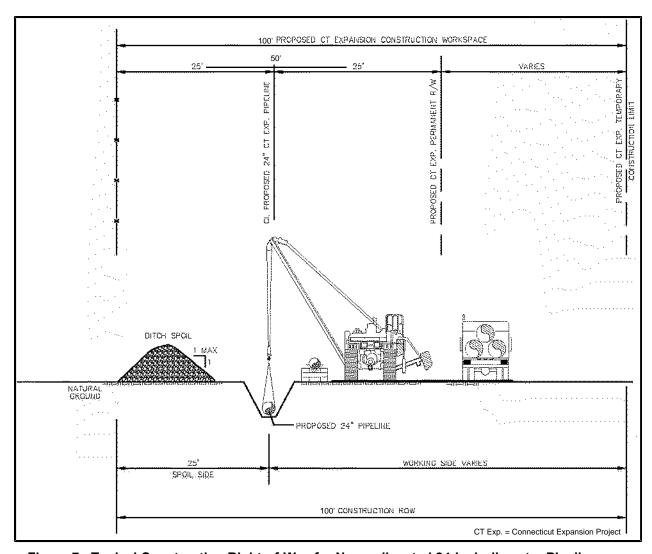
Typical Construction Right-of-Way for Non-collocated 24-inch-diameter Pipeline
